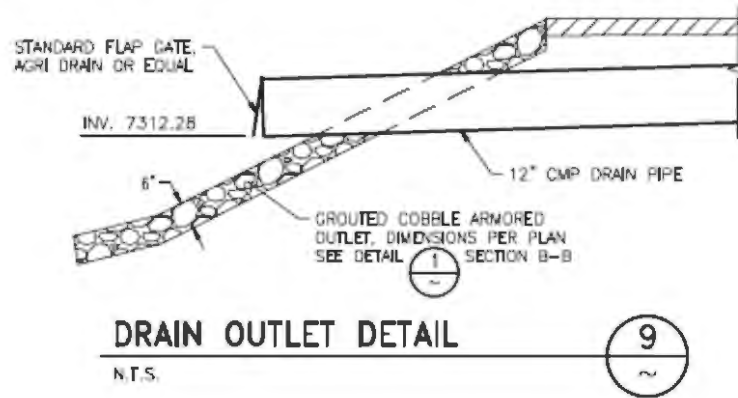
EXAMPLE PIPE OUTLET EROSION CONTROL
